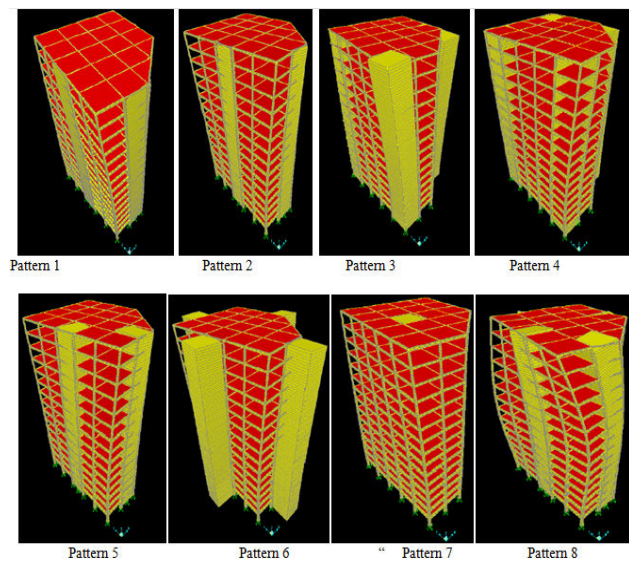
Deformed shapes of 15-story building in its 1-st mode for eight placement-shape patterns of shear walls
